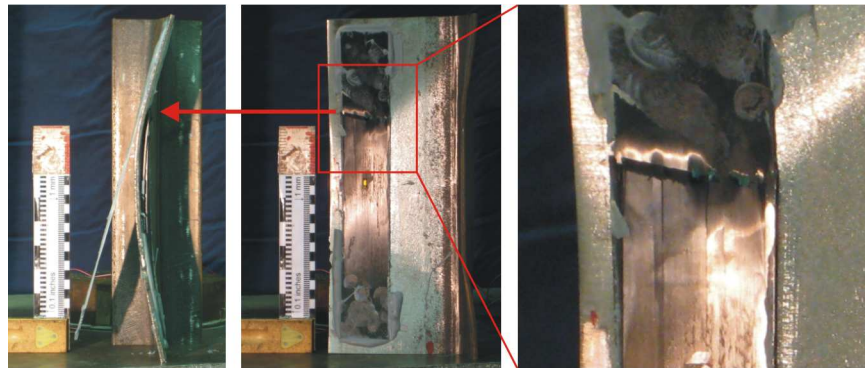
Specimen CFRP-2-90 showing compressive failure of bonded CFRP.
